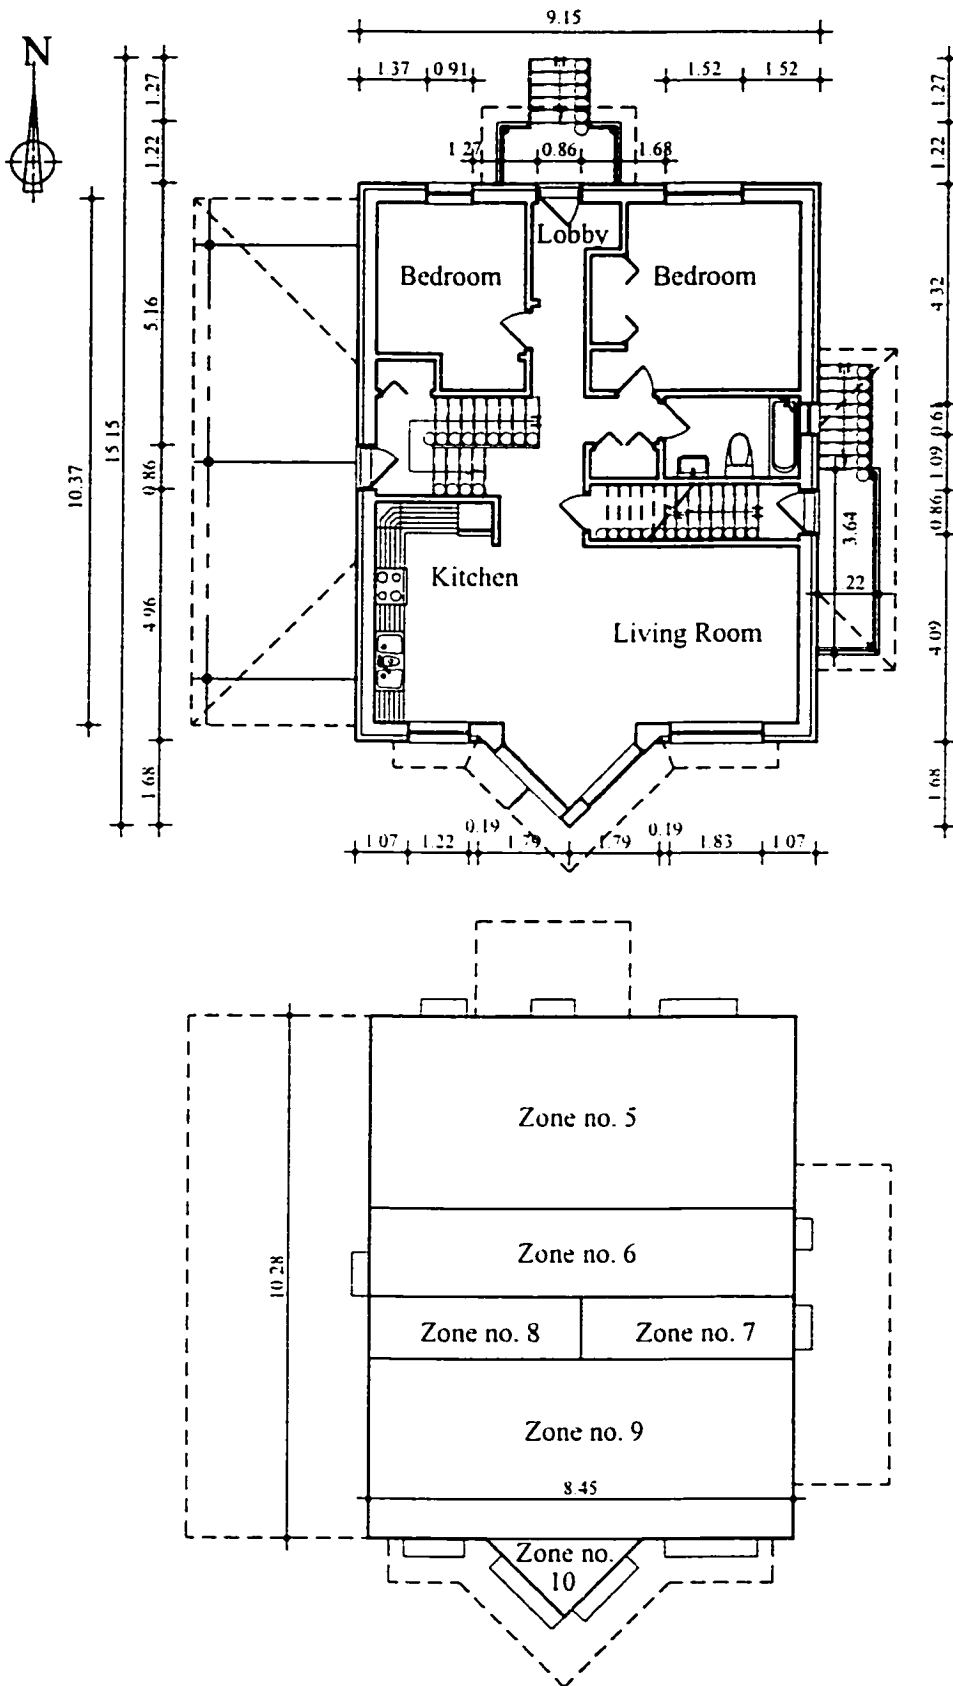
Ground floor plan and related thermal zones of the base case house
